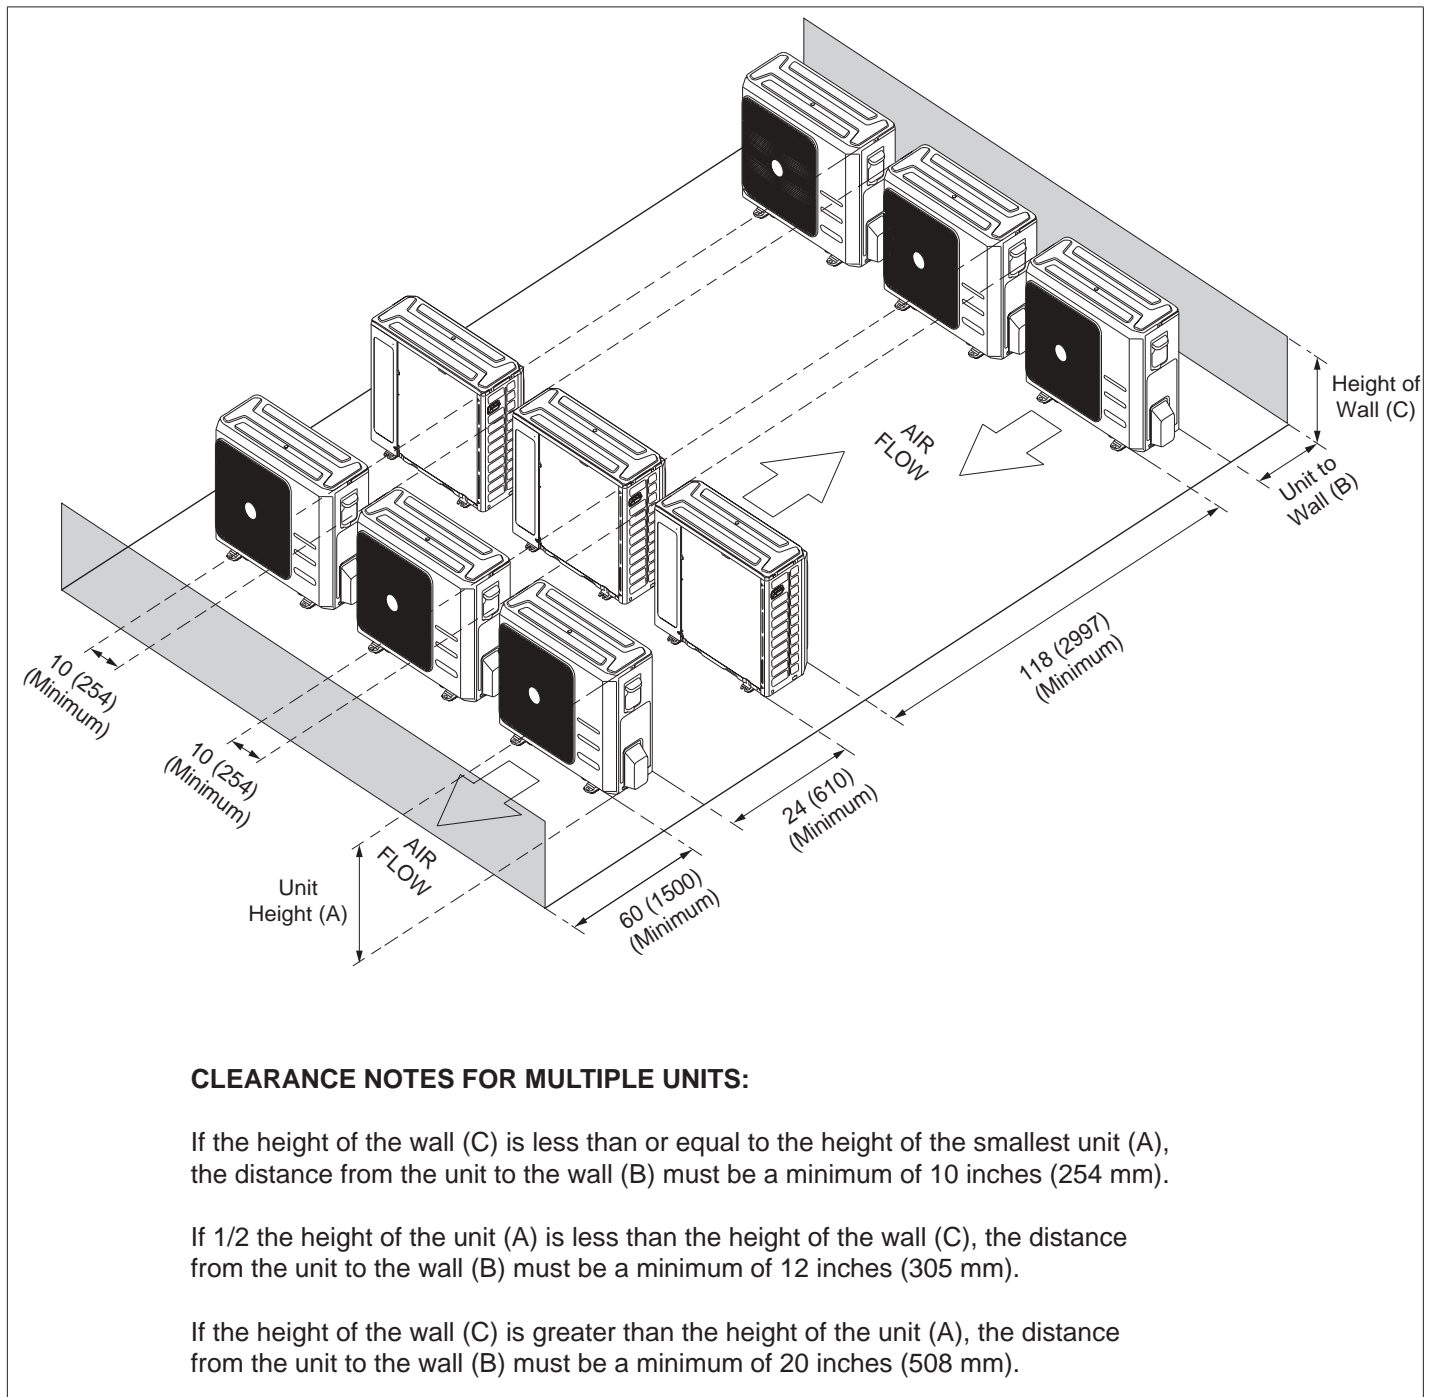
Multiple Outdoor Unit Clearances - Inches (mm)
